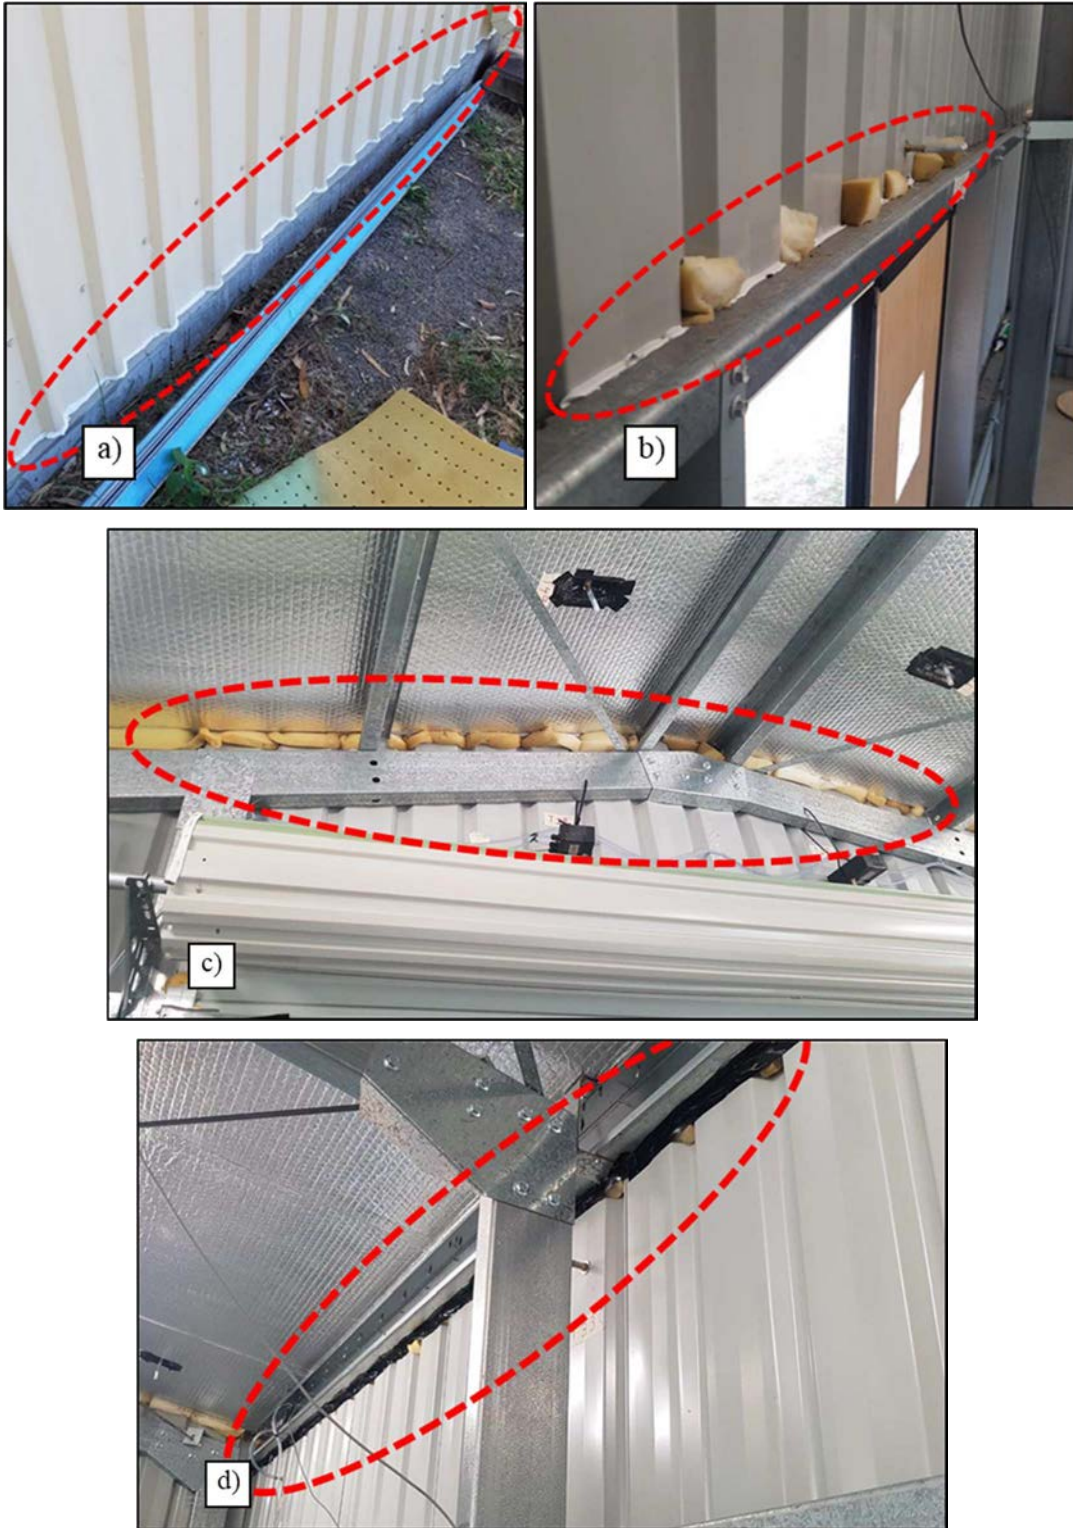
Sealed porous openings on the “Baseline” building, (a) Silicon around perimeter of floor slab (b) Silicon and foam above windows/doors (c) Foam blocks compressed into gable-end roof (d) Adhesive tape and foam under eave strut
